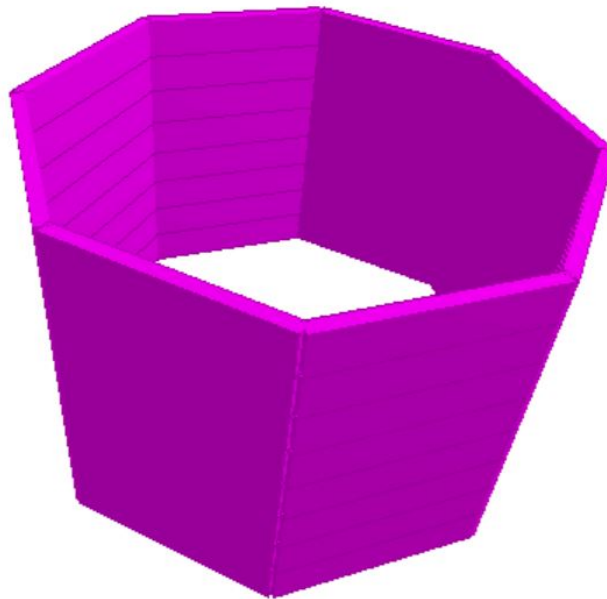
Cylindrical Tank wall modelled on STAAD Pro
